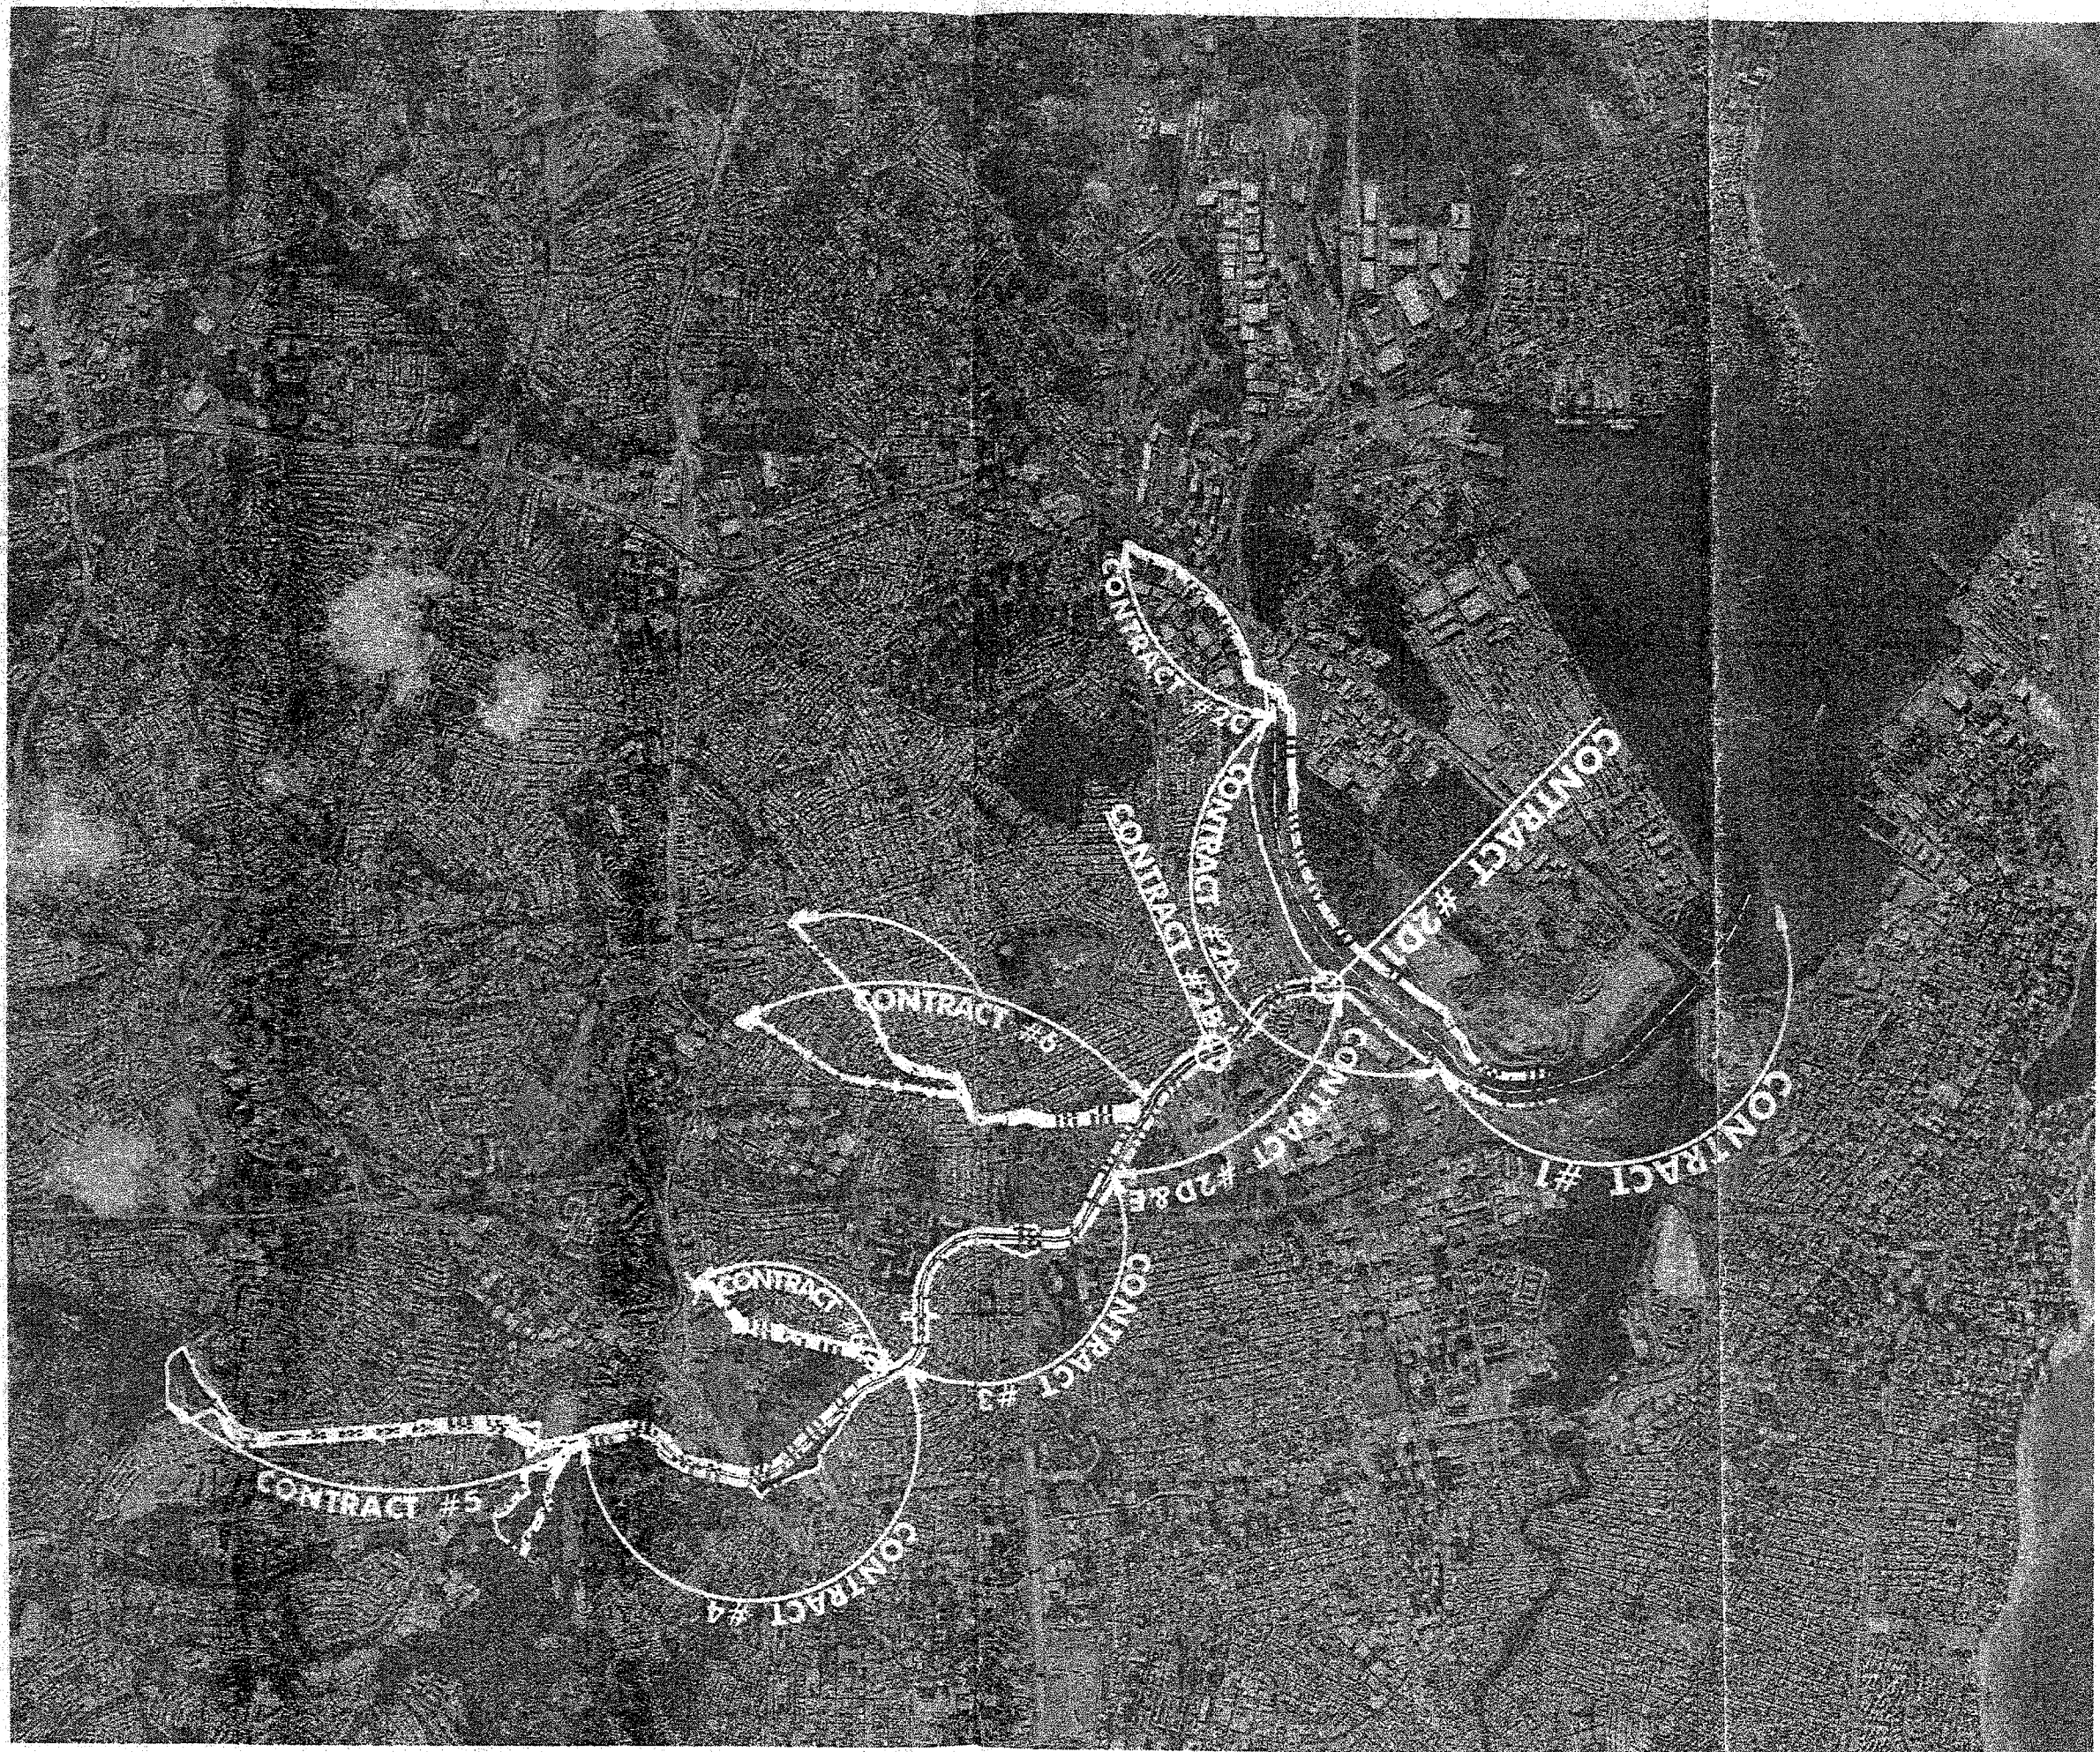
"No Action" or GDM plan, with connector canal and pump station added.
